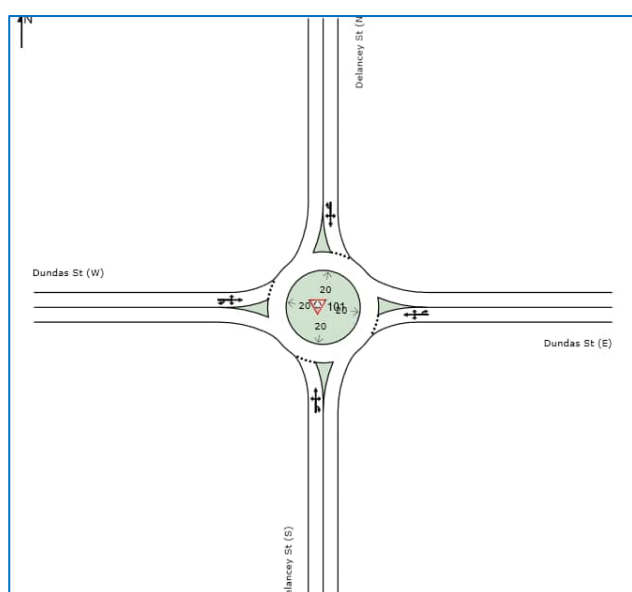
SIDRA Generated Layout of the Delancey Street / Dundas Street West Intersection.
